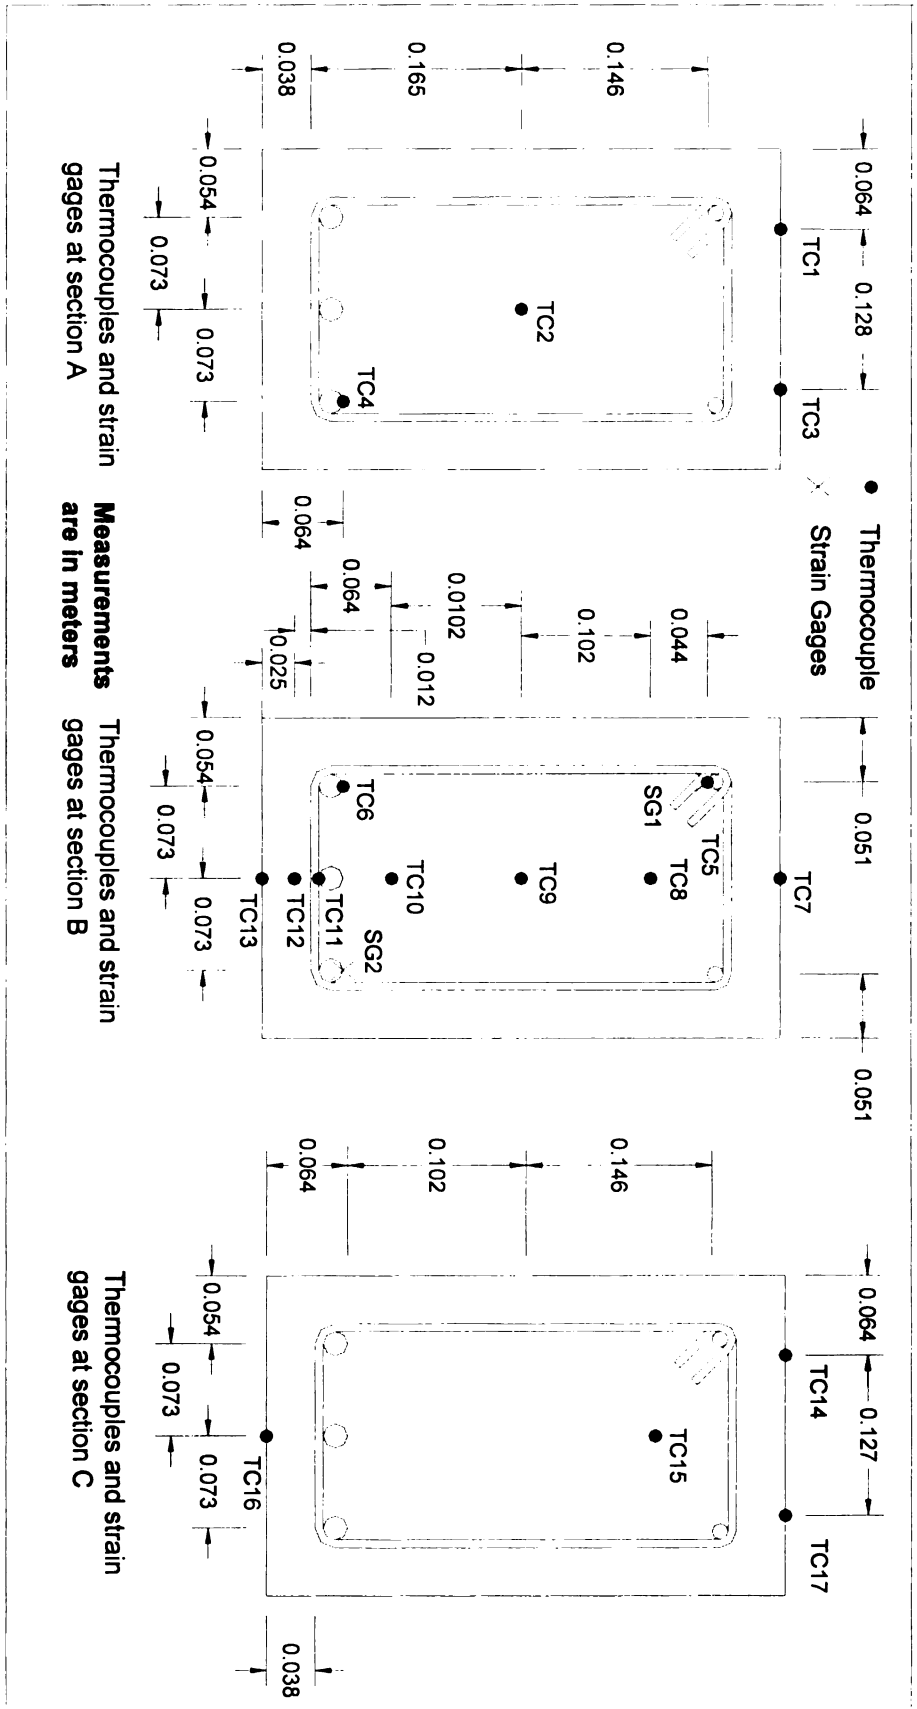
(c) – Cross-section and Location of Thermocouples and Strain Gages in Beams B5 and B6
